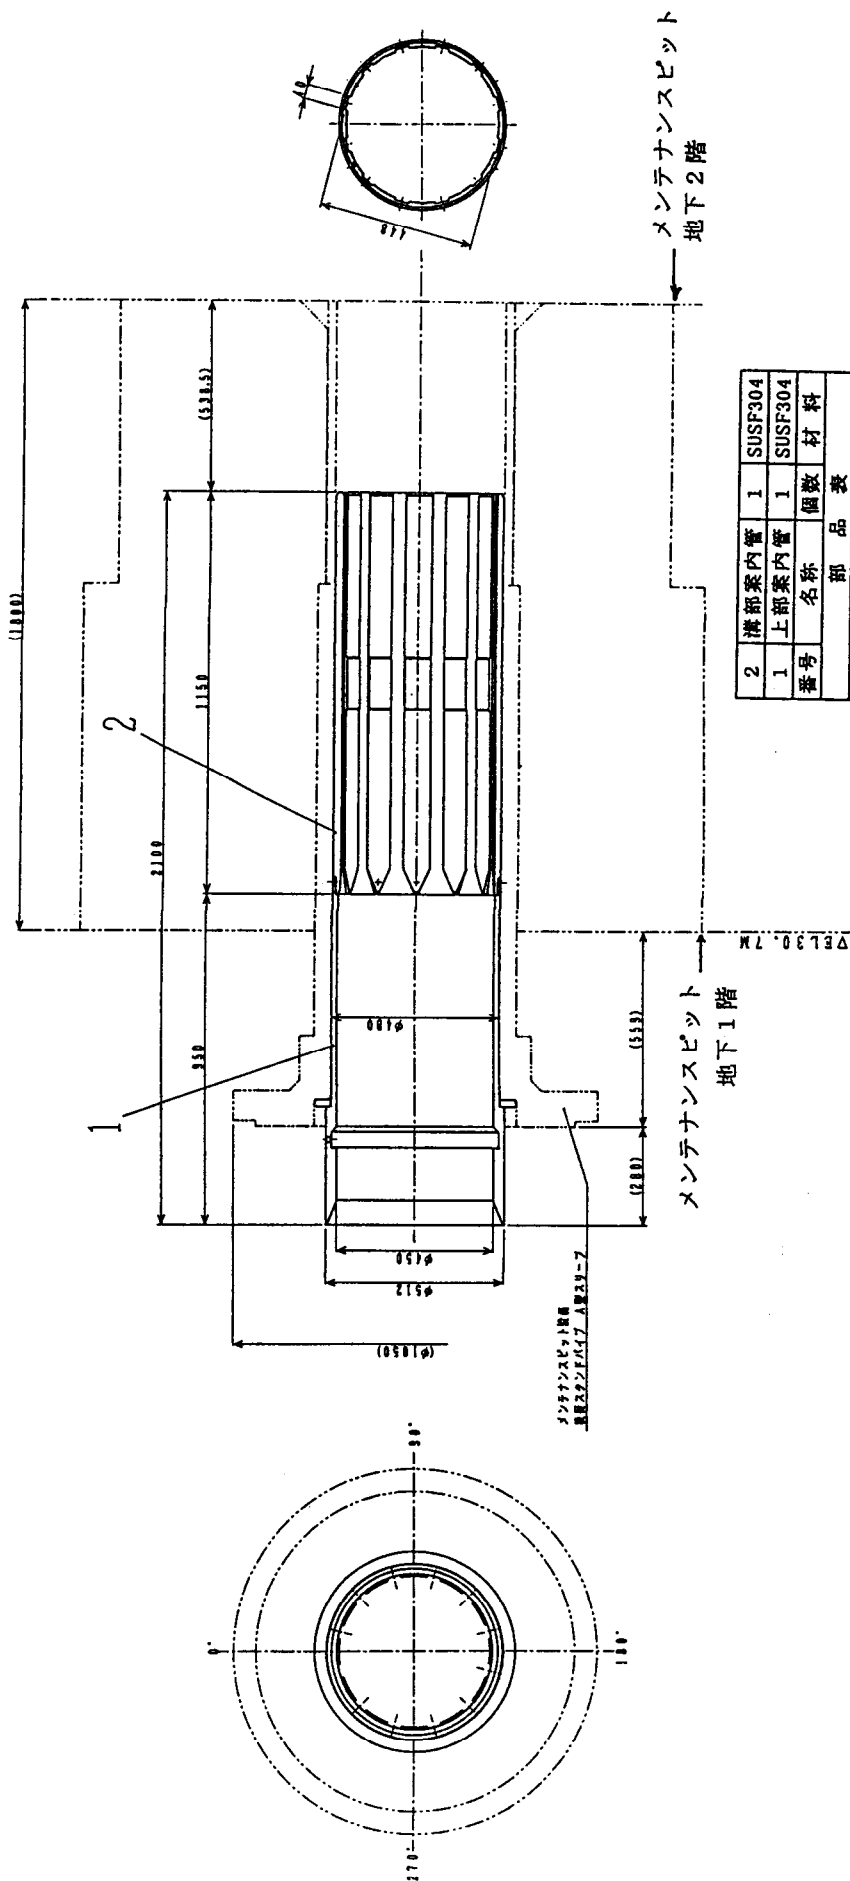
Structural drawing of guide tube for gripper of fuel handling machine installed in penetration hole between 1st and 2nd basement of HTR maintenance pit
